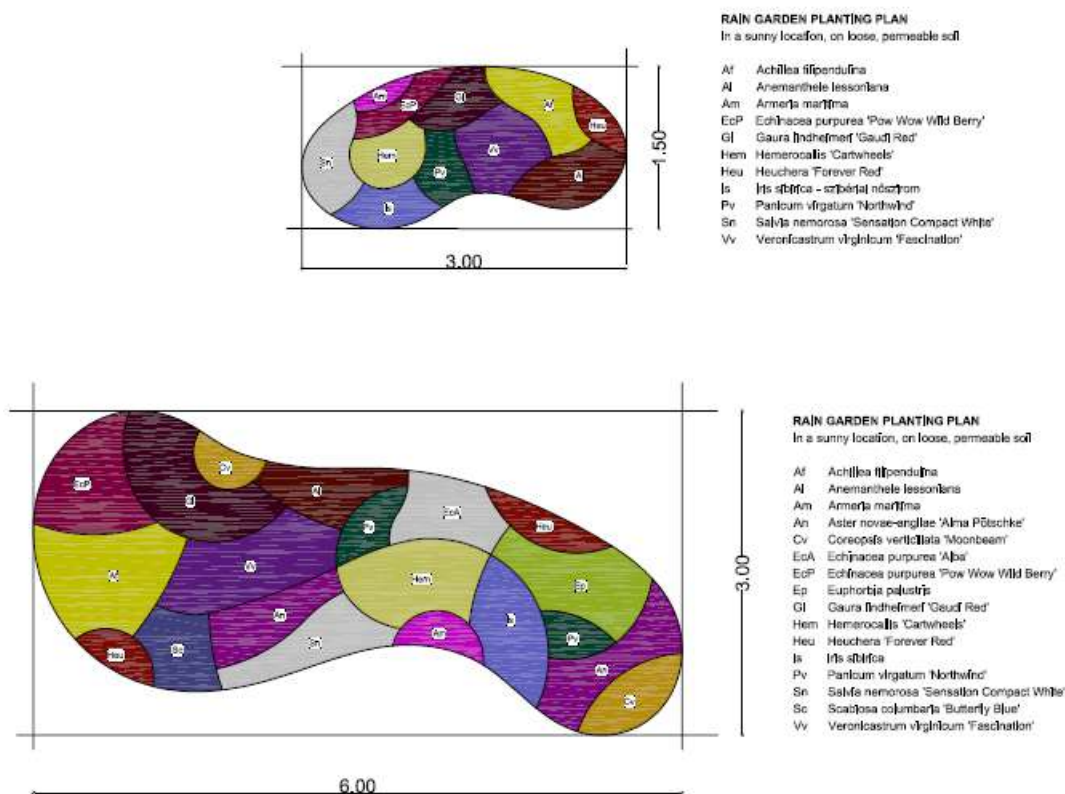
Planting plans created for UPSURGE project (standard design for different locations and soil type) (Annex BP18 design plans Chapter 3.1 and 3.4)
